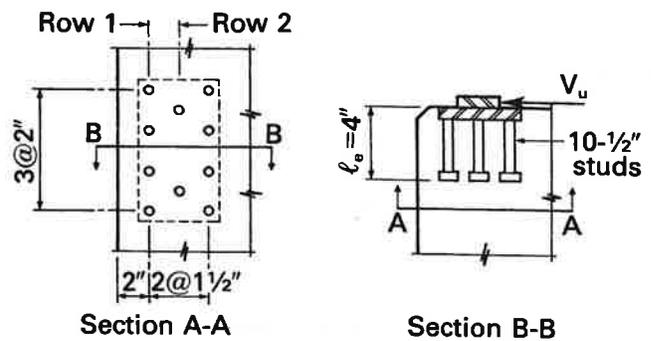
Pullout surface areas for stud groups in thin sections
